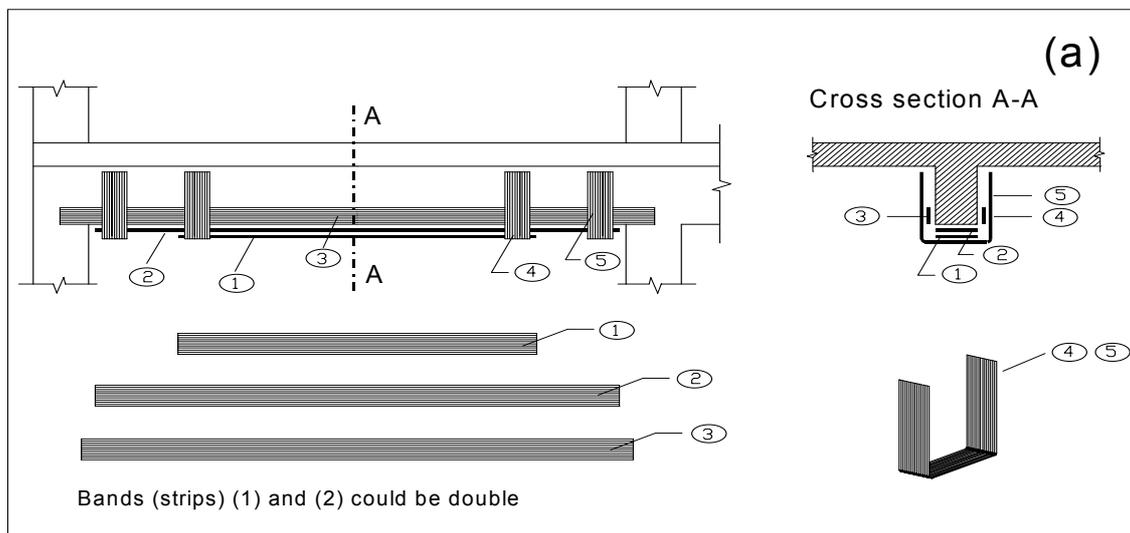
Flexural reinforcement with possible shear anchorages.
